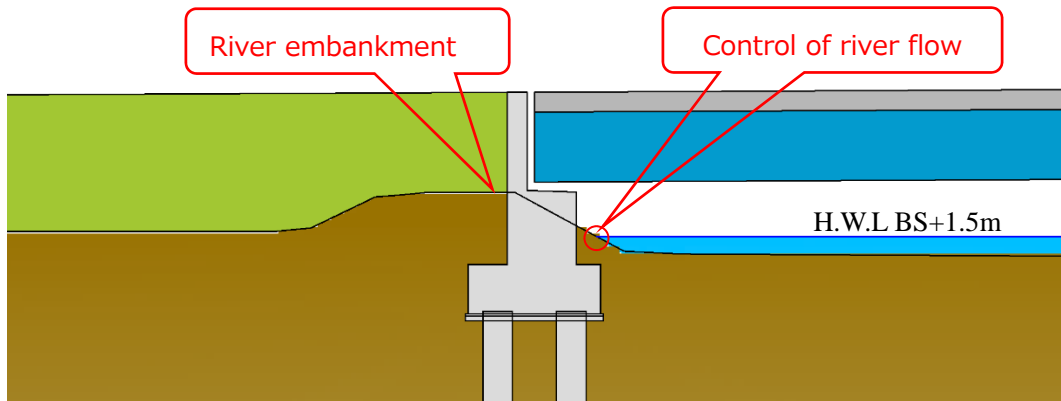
The Left Bank Side Abutment Layout (Route3)
